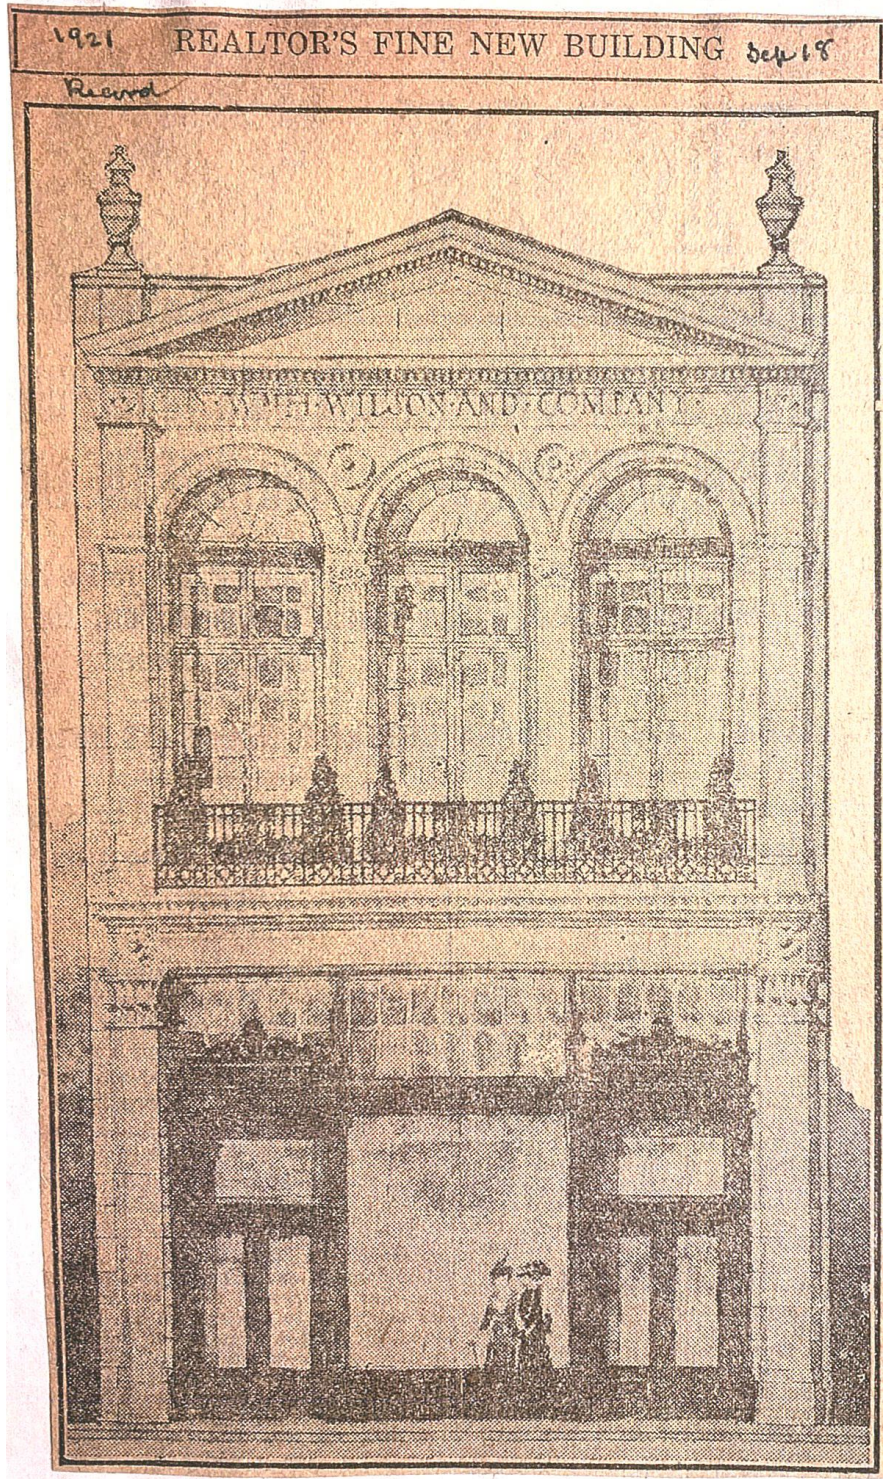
1921 news clipping shows the original facade of 1617 Walnut Street.
